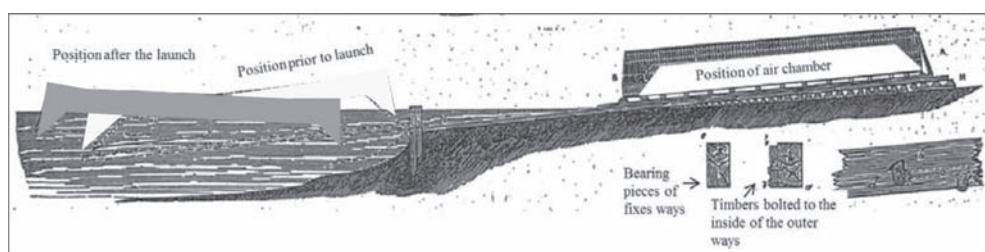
Launching of the Brooklyn caisson (Engineering 1870).
